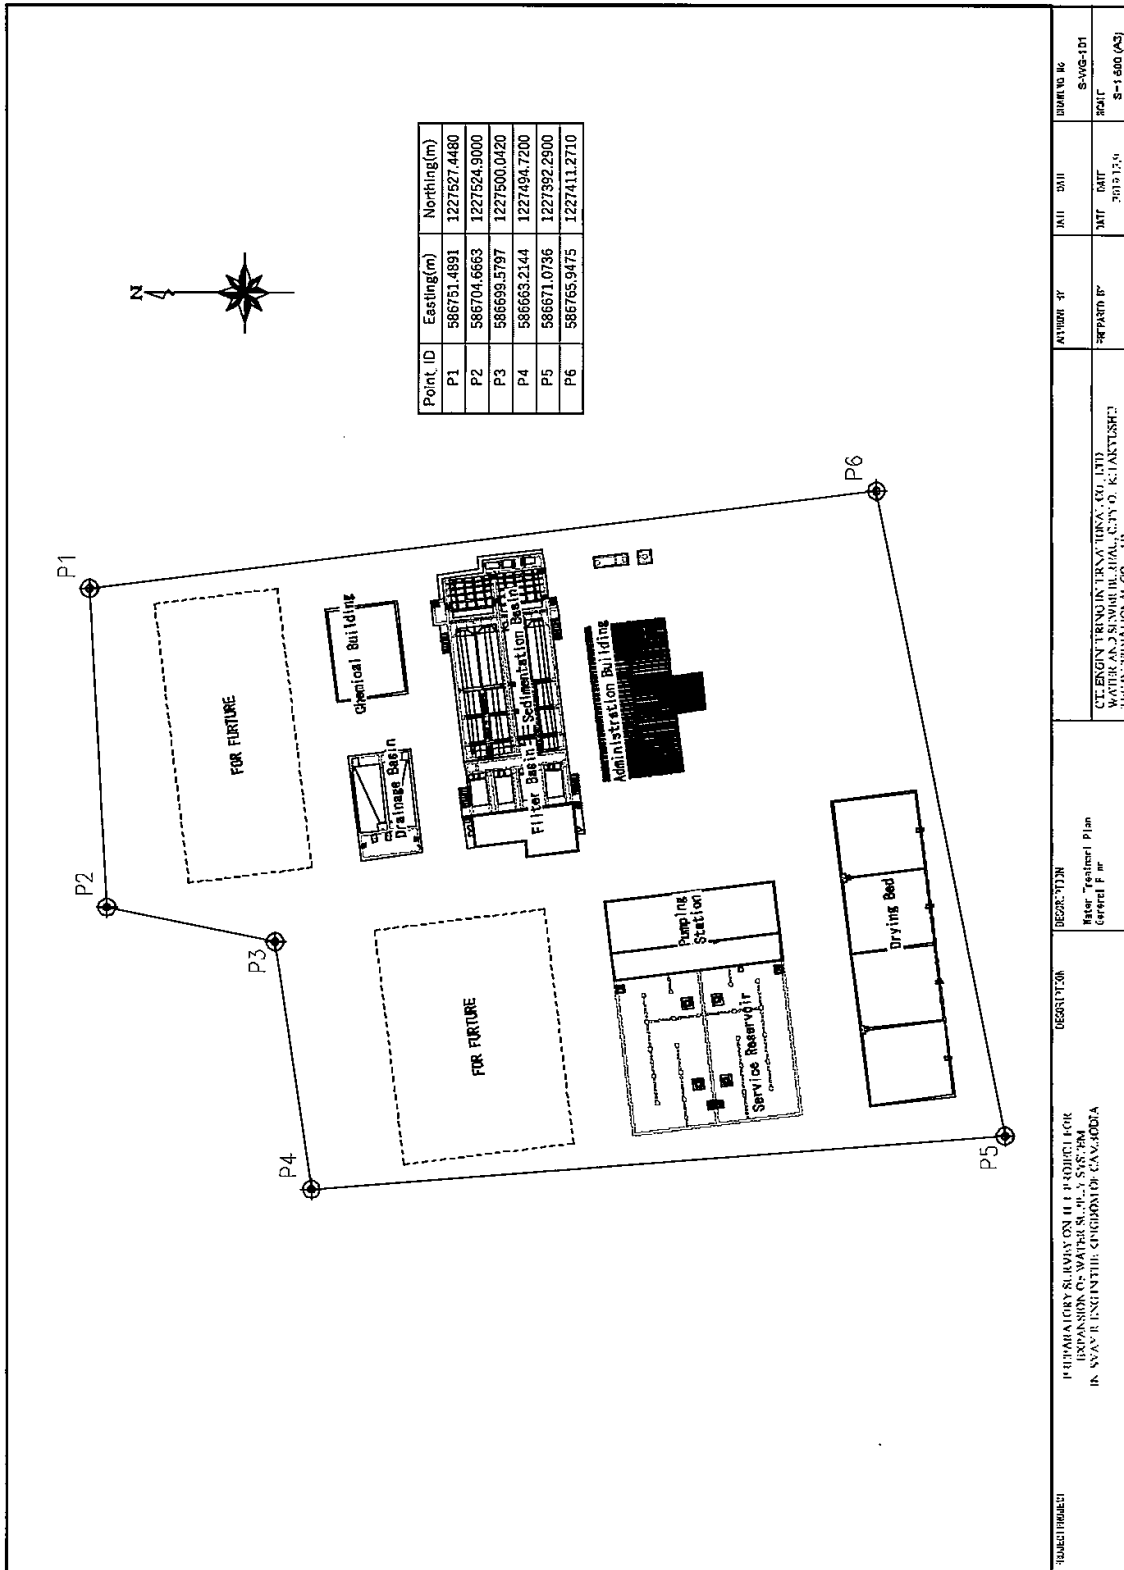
Layout of New WTP (one of the alternative layouts)
